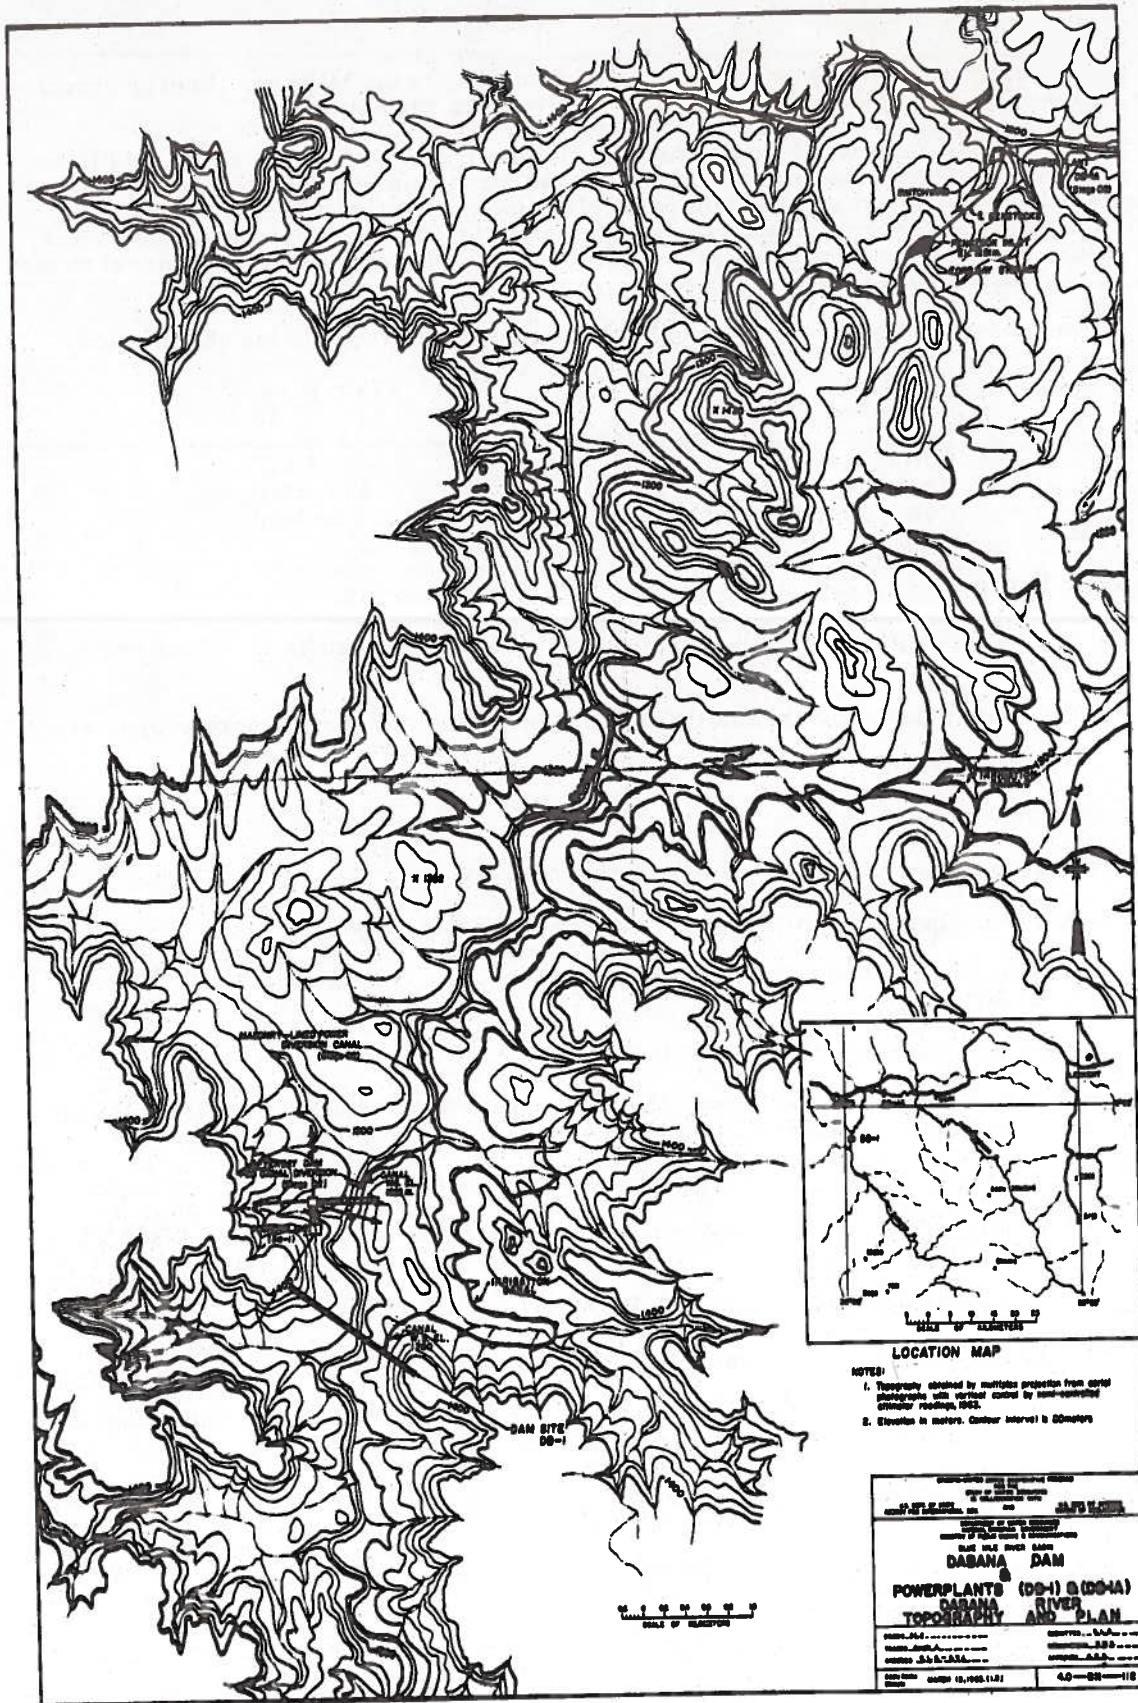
Dabana Dam and Powerplants DB-1 and DB-1A, Topography and Plan
